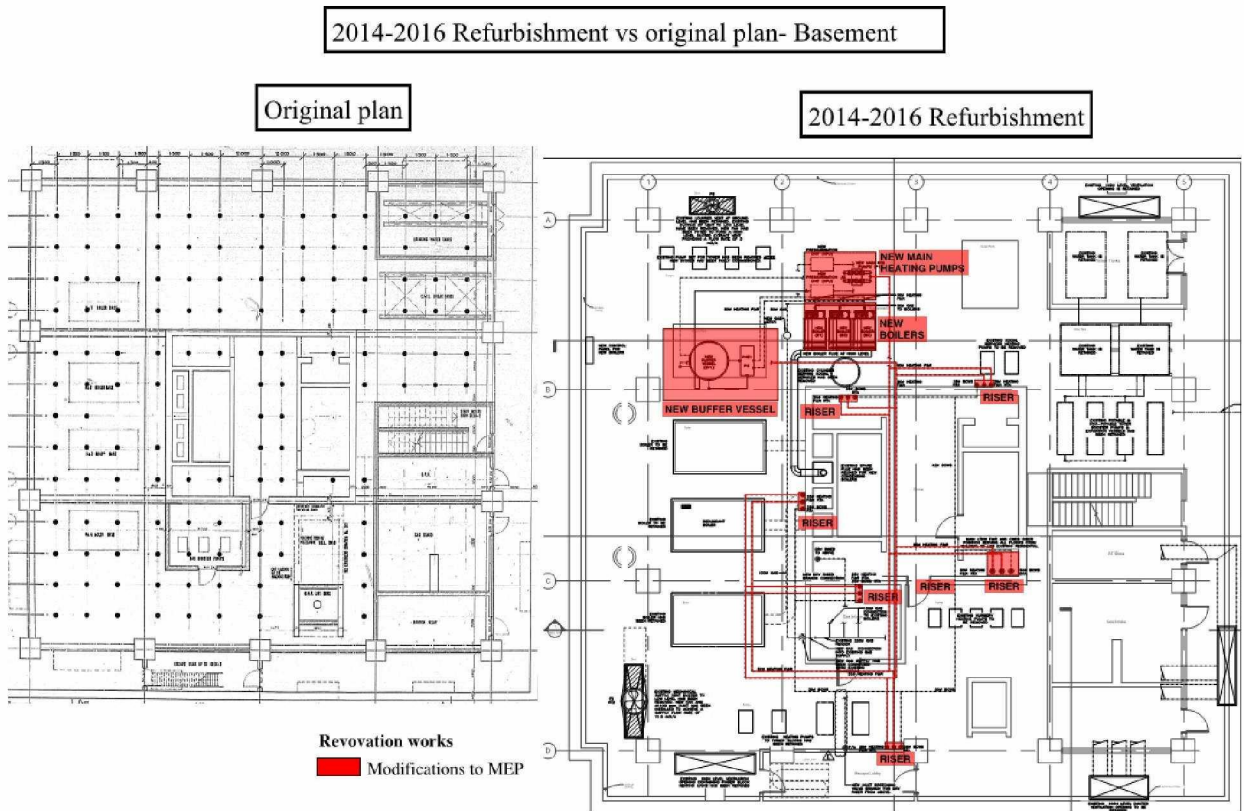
Basement level – refurbishment plan and original basement plan (RBK00018843, RYD00006577)
